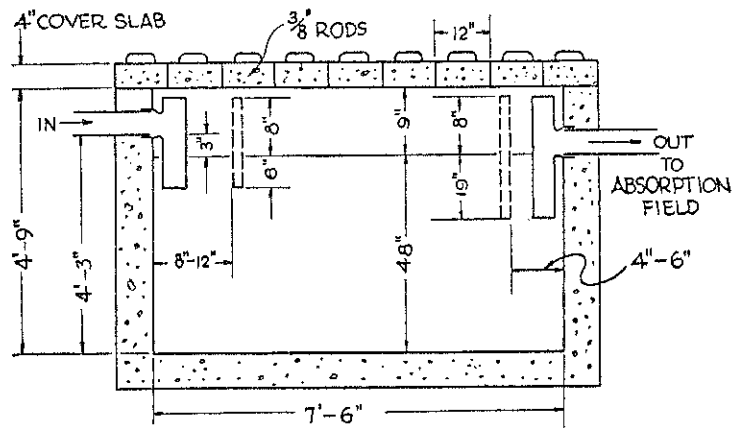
Diagrammatic sketch of a section through a 750-gallon septic tank having a 3-foot 6-inch inside width. Cast-in-place concrete tanks have walls and floors 6 inches thick.
